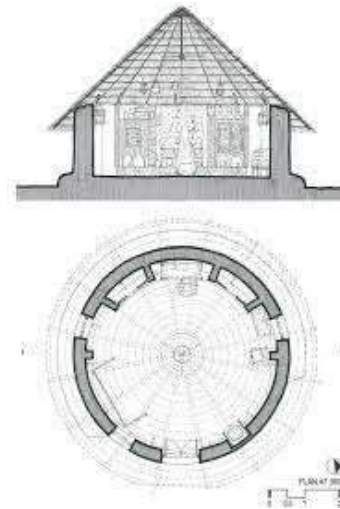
Plan and Section of Bhunga House Source: Department of Architecture & Interior Design\
